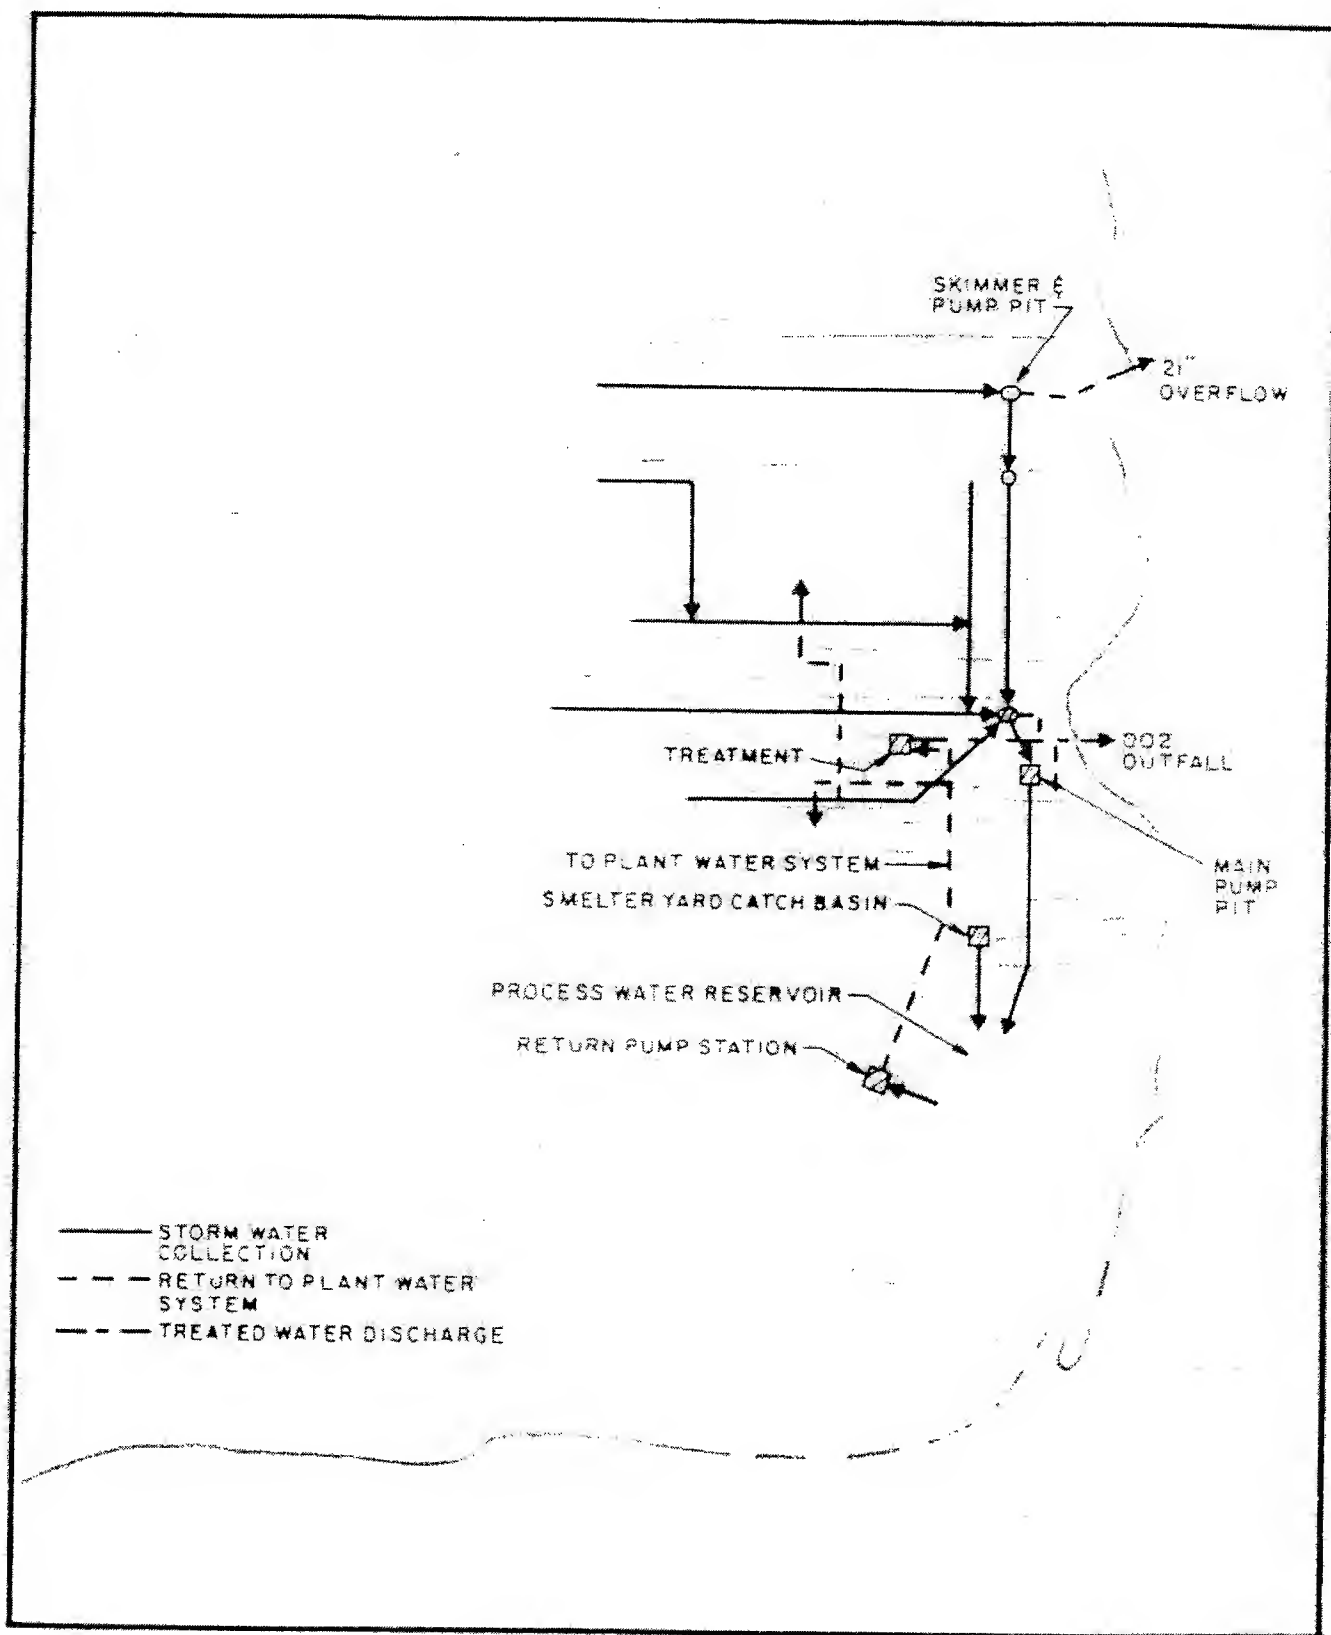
SCHEMATIC LAYOUT OF PROCESS AND STORM WATER SYSTEM
